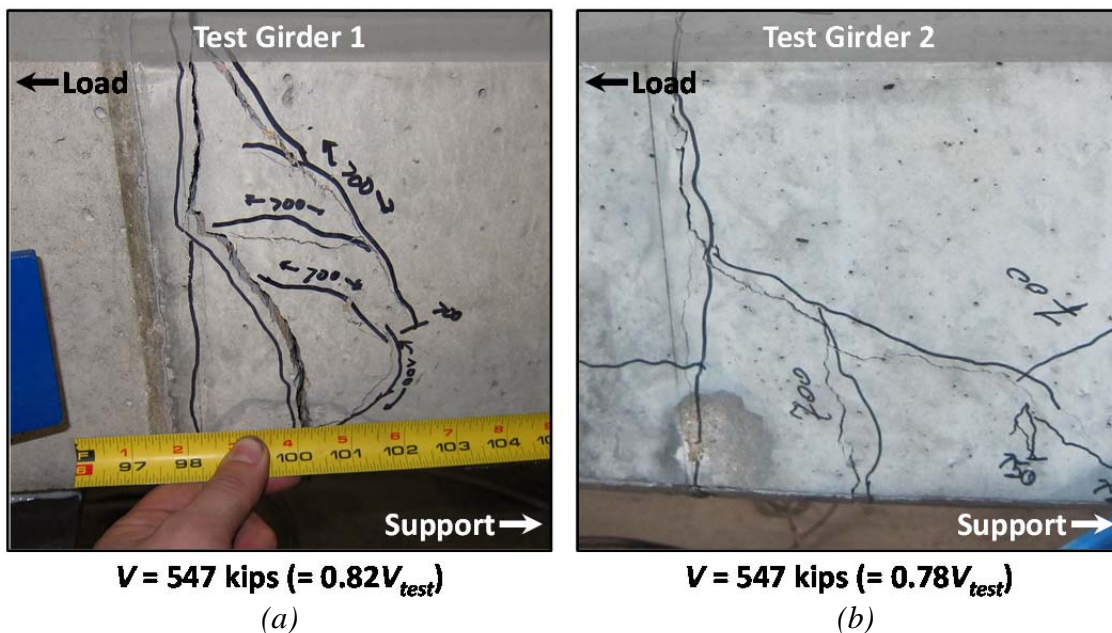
Flexural cracking near the splice region interface – (a) Test Girder 1; (b) Test Girder 2
